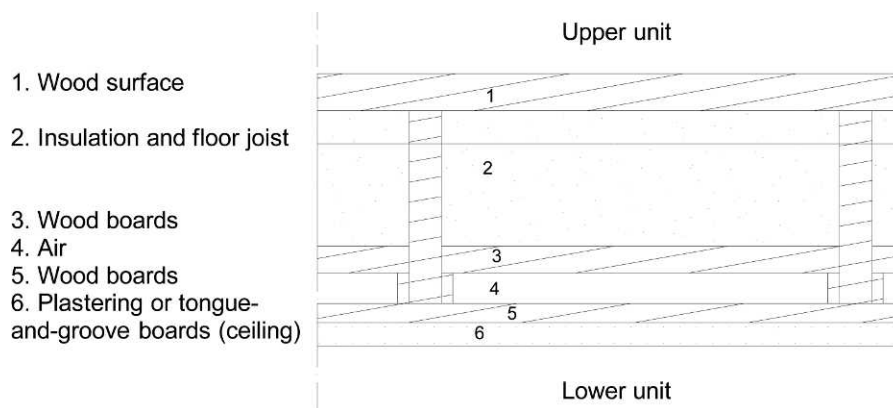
An example of an intermediate wood floor construction in an apartment building at the beginning of the 20th century. (Illustration based on Neuvonen et al. 2002.)
